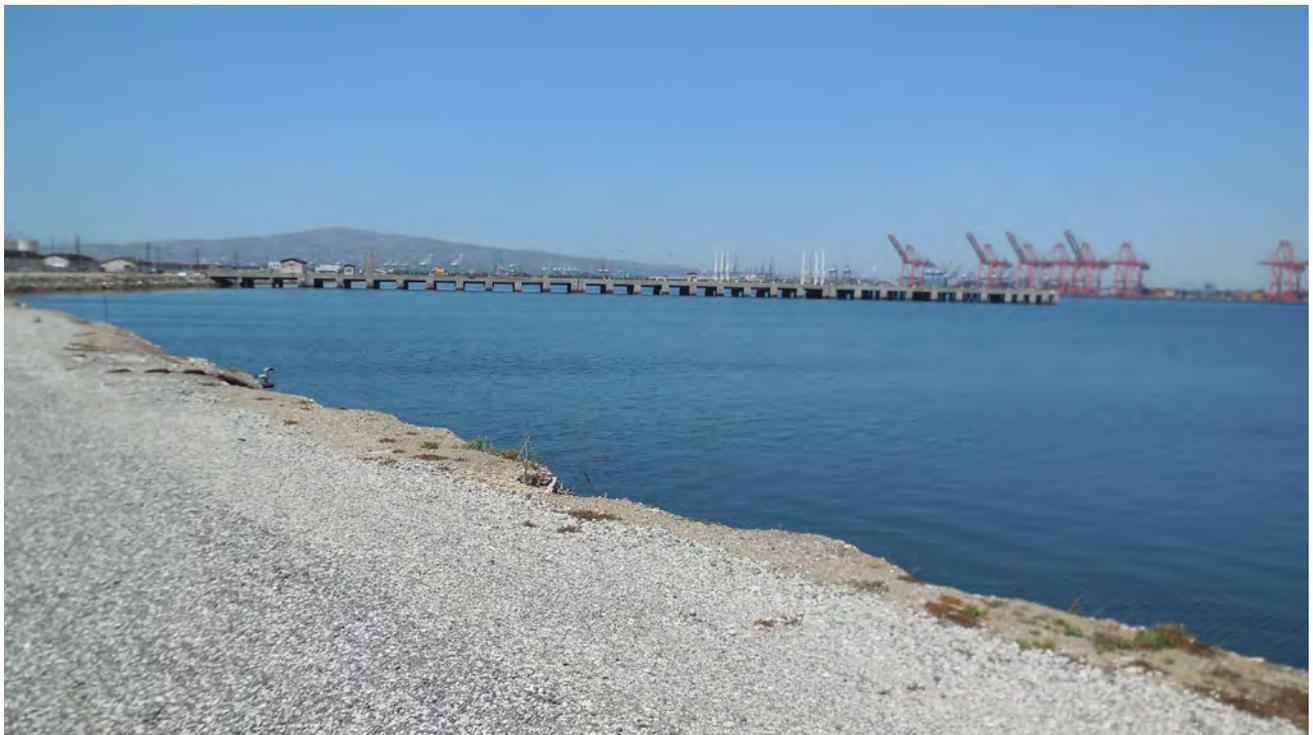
VIEW OF PIER 12 TAKEN FROM NAVY MOLE, FACING WEST
